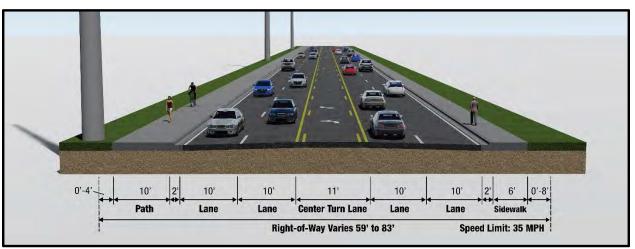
Alternative A – Typical Section from Old Canoe Creek Road to US 192
